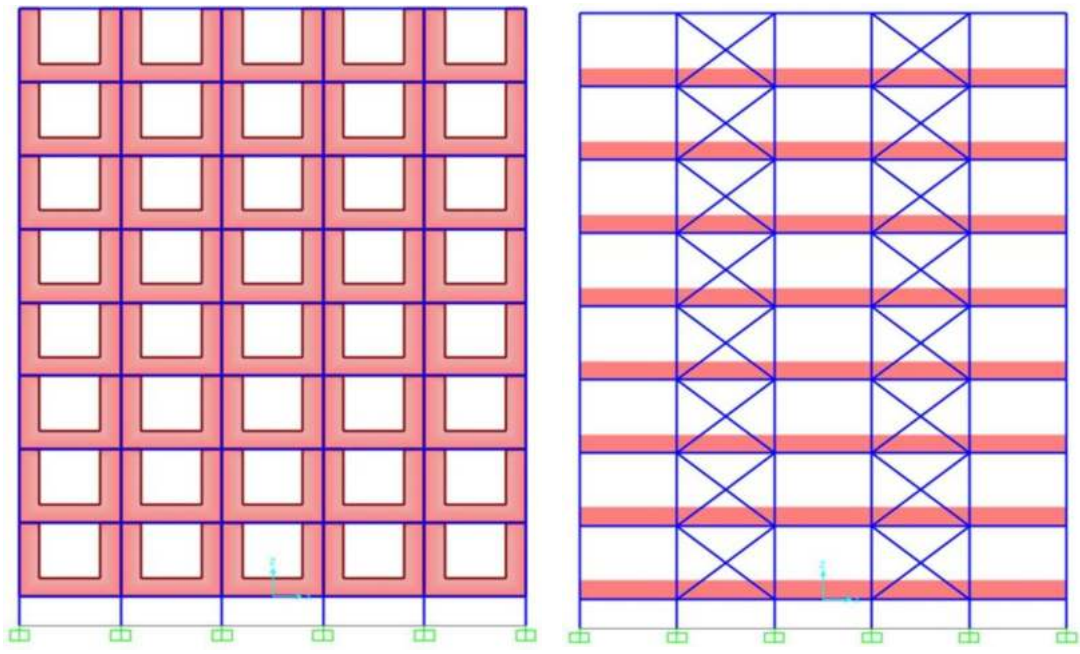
Elevation of 25% Partially in-filled frame with additional in-fills adjoining the column
